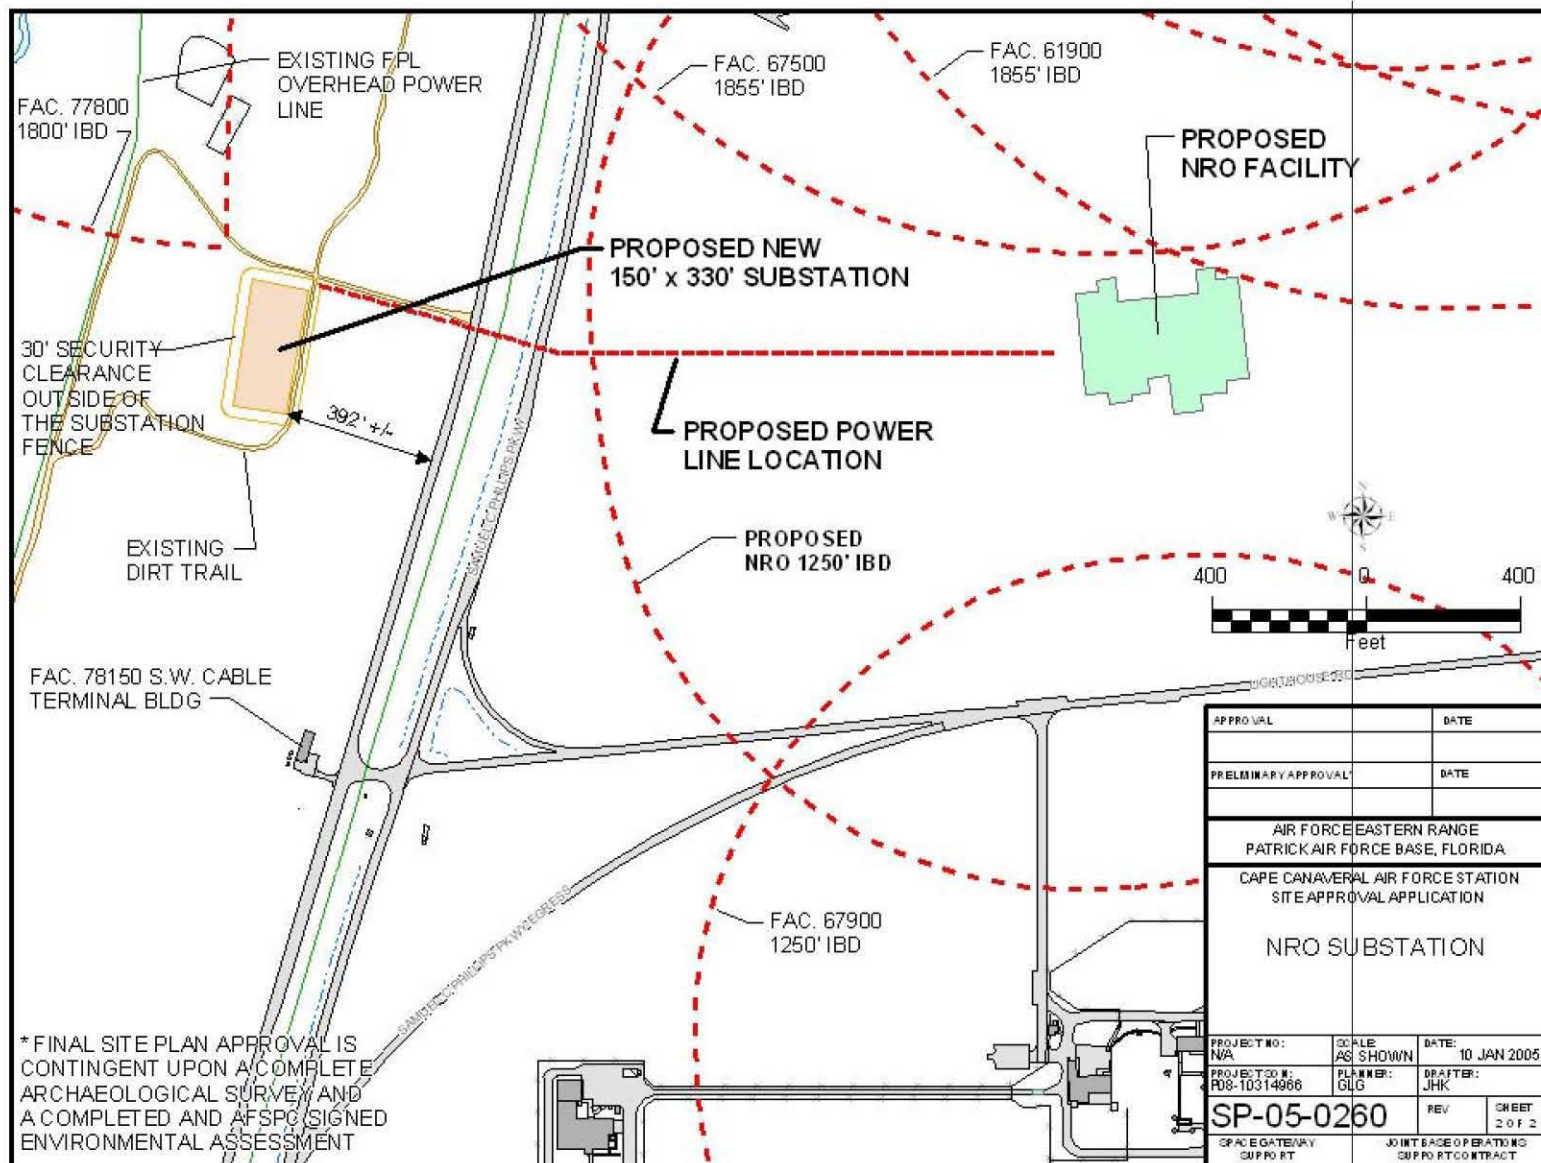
Proposed layout of the Eastern Processing Facility (EPF) Substation
